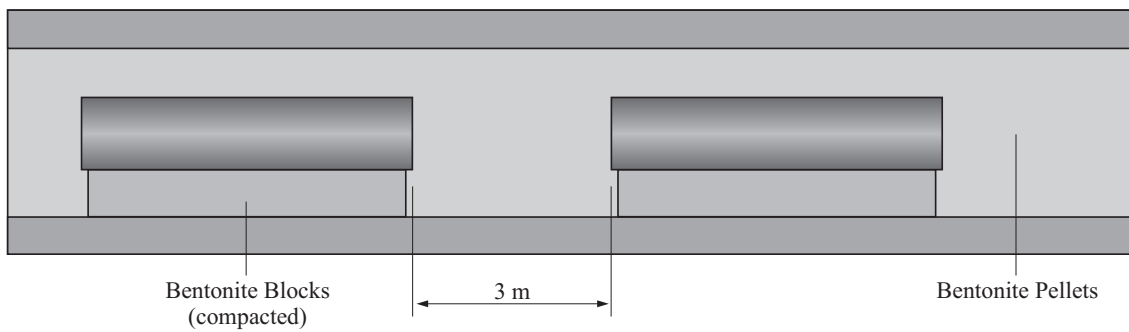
Longitudinal section of emplacement tunnels for HLW and SF
